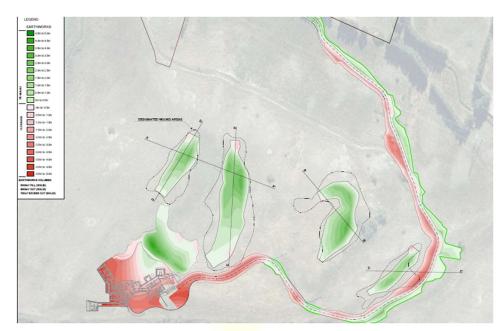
Proposed Cut (Red) and Fill (green) for the dwelling and upper driveway
